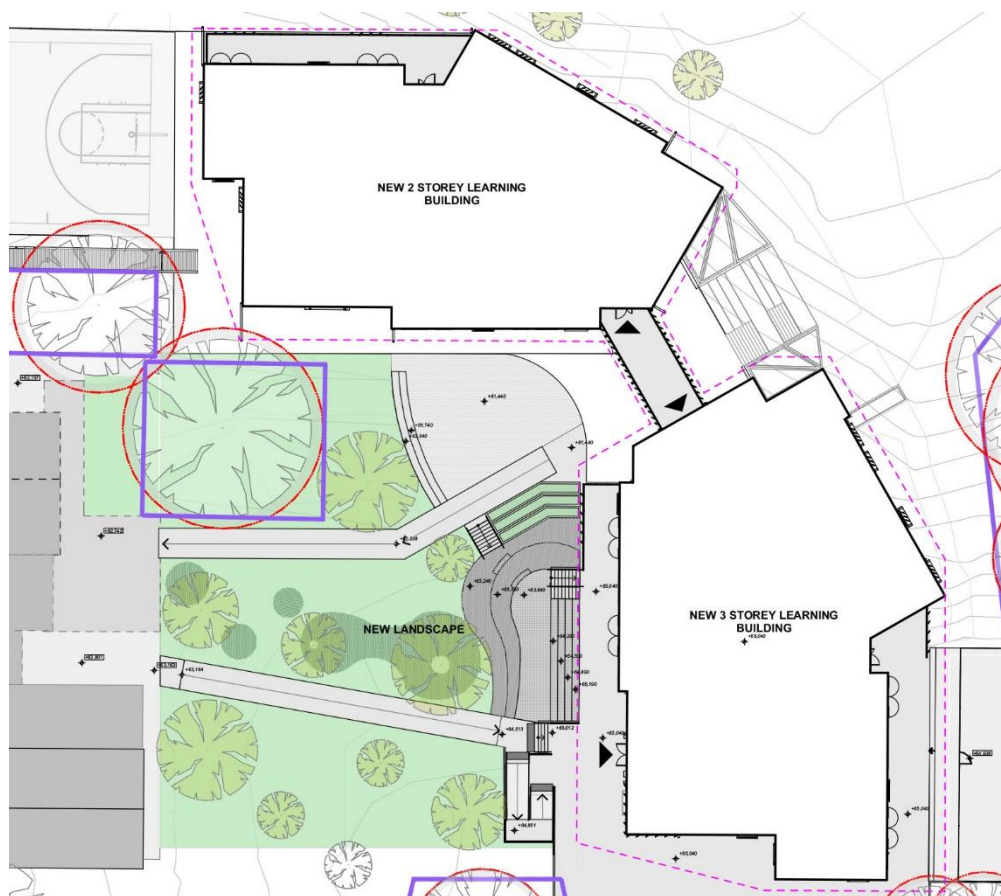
Part landscape plan – deep soil zones adjacent learning building
